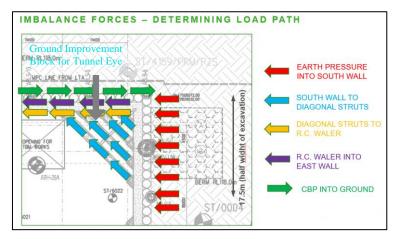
Expected Load Path from South CBP Wall to East CBP Wall
